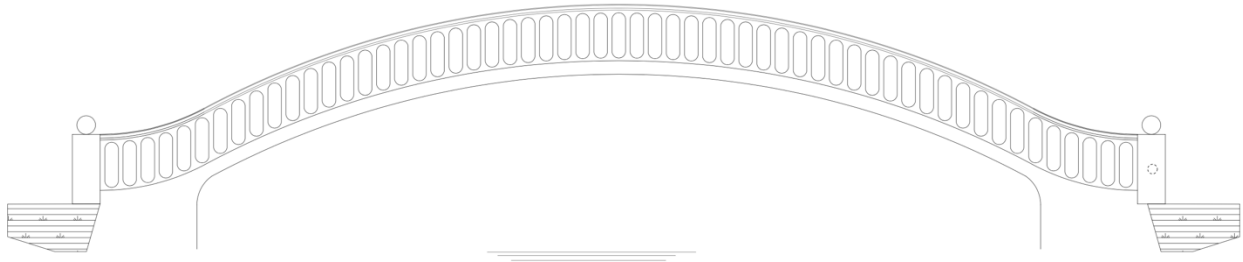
Smith-Ransome Japanese Bridge Elevation. Source: Tim Michiels, *Old Structures Engineering*, March 24, 2021.
